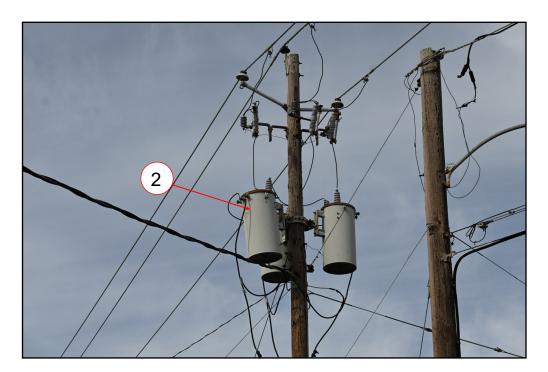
Local Utility transformers with 208/120 secondary furnishing existing FBO Terminal Building
